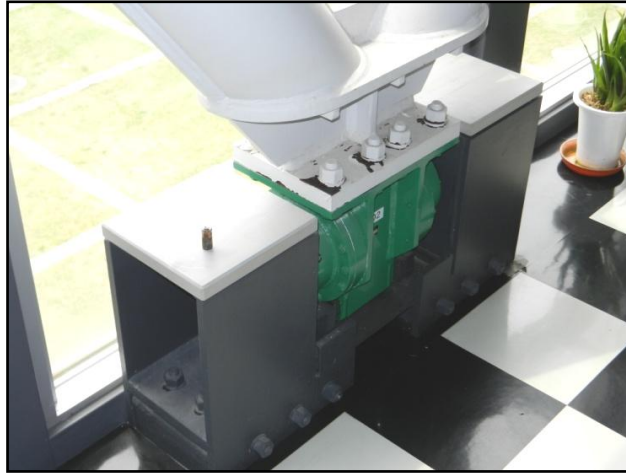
Oil damper and snubber assembly at Tohoku Institute of Technology Building B10, second floor
